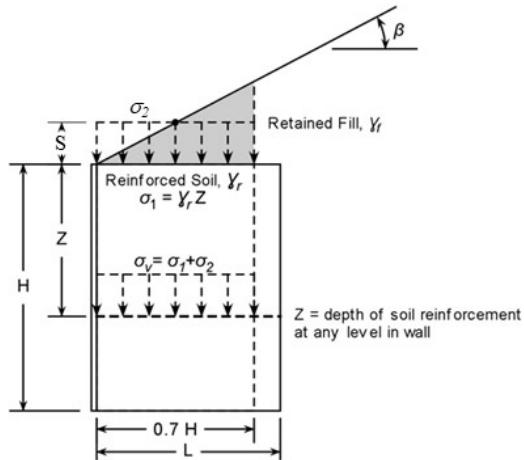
1—Calculation of Vertical Stress for Sloping Backslope Condition for Internal Stability Analysis
